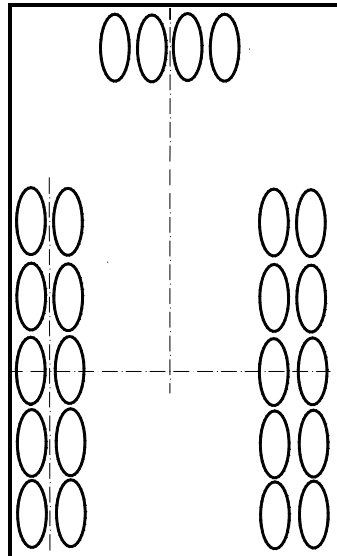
2D/2D2 - Two Dual Wheels in Tandem Main Gear/Two Dual Wheels in Tandem Body Gear with Dual Wheel Nose Gear, Boeing B-747
